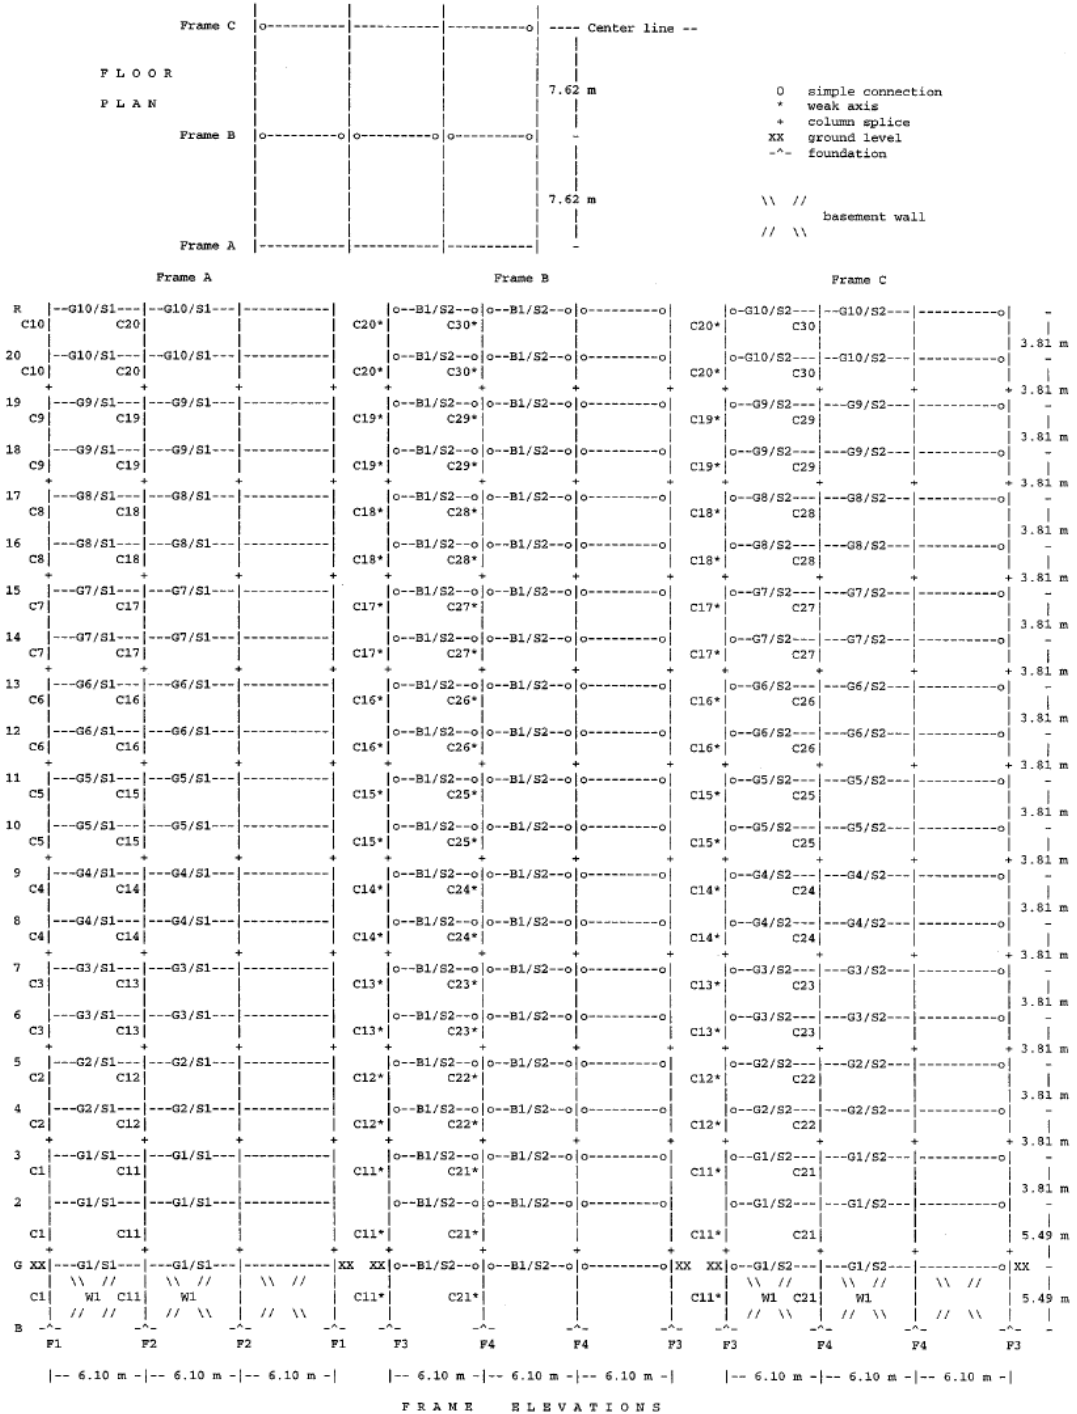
Floor plan and frame elevations of the 20-story building designed according to the Japanese building code (J20) (Hall, 1997).
